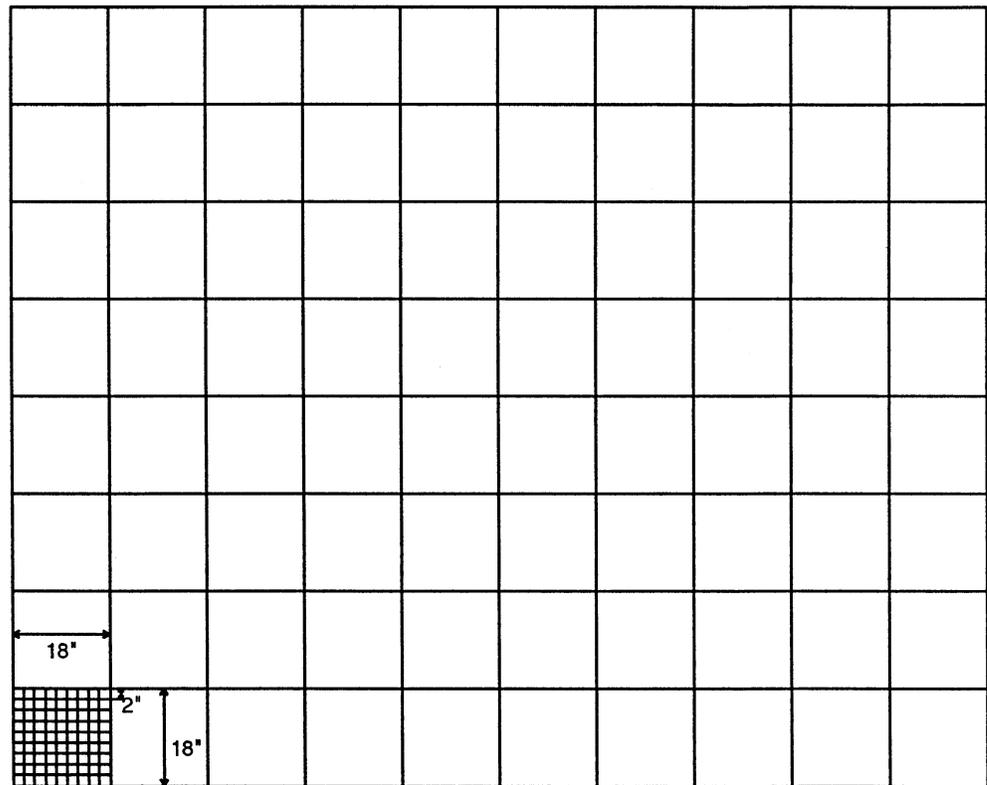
Floor Template — 18-Inch Tile (L472366)
